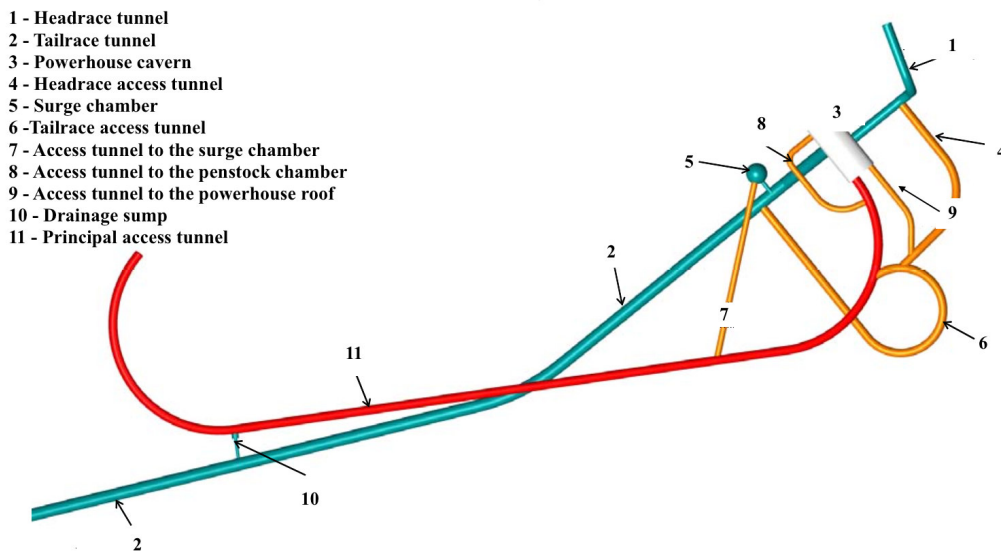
Salamonde II underground structures detailed scheme (adapted from EDP (2009)).
